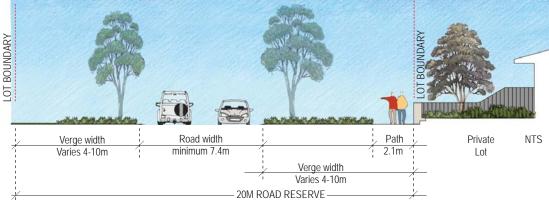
ROAD TYPOLOGY SECTIONS
